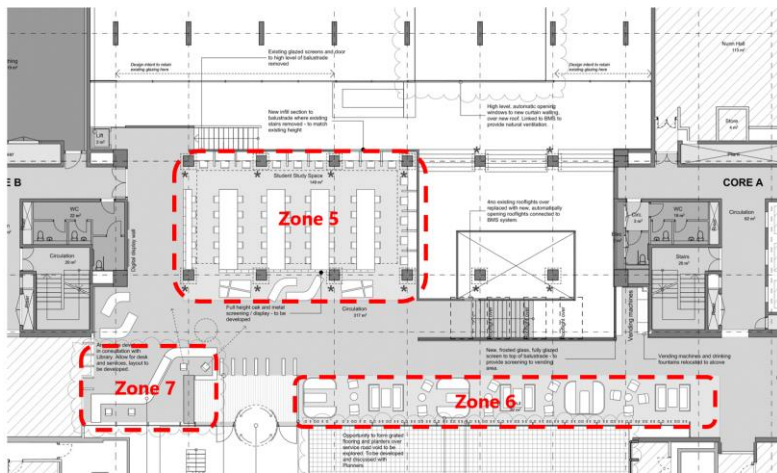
3 assessed zones based on new layout and arrangement for level 4
